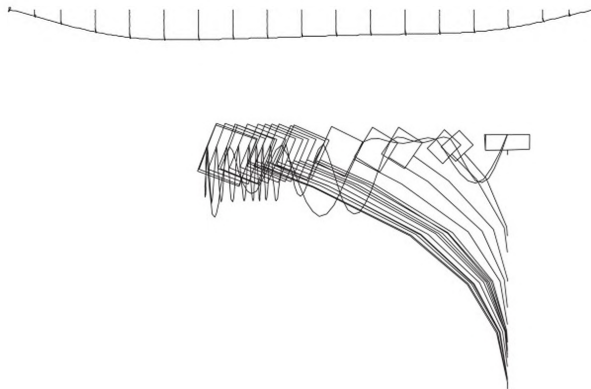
Plan deck and elevation view of the piers under view. Eccentric railway loads.
